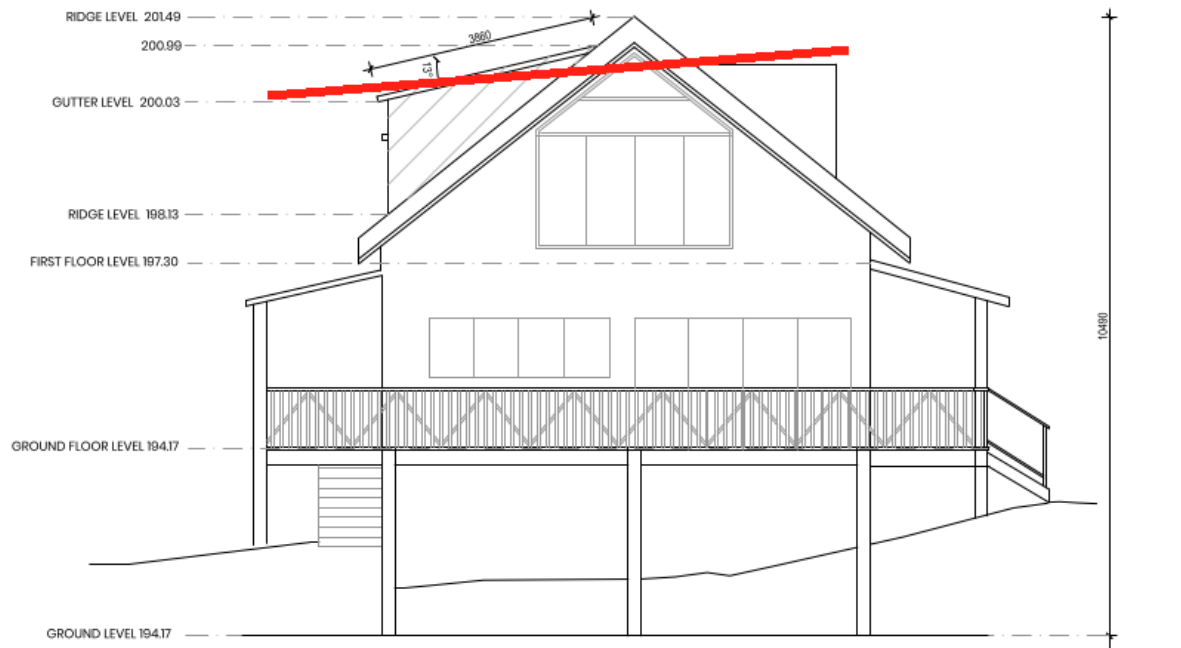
Extract of Application plans by Drafted Up showing Eastern Elevation with 8.5m building height in red
